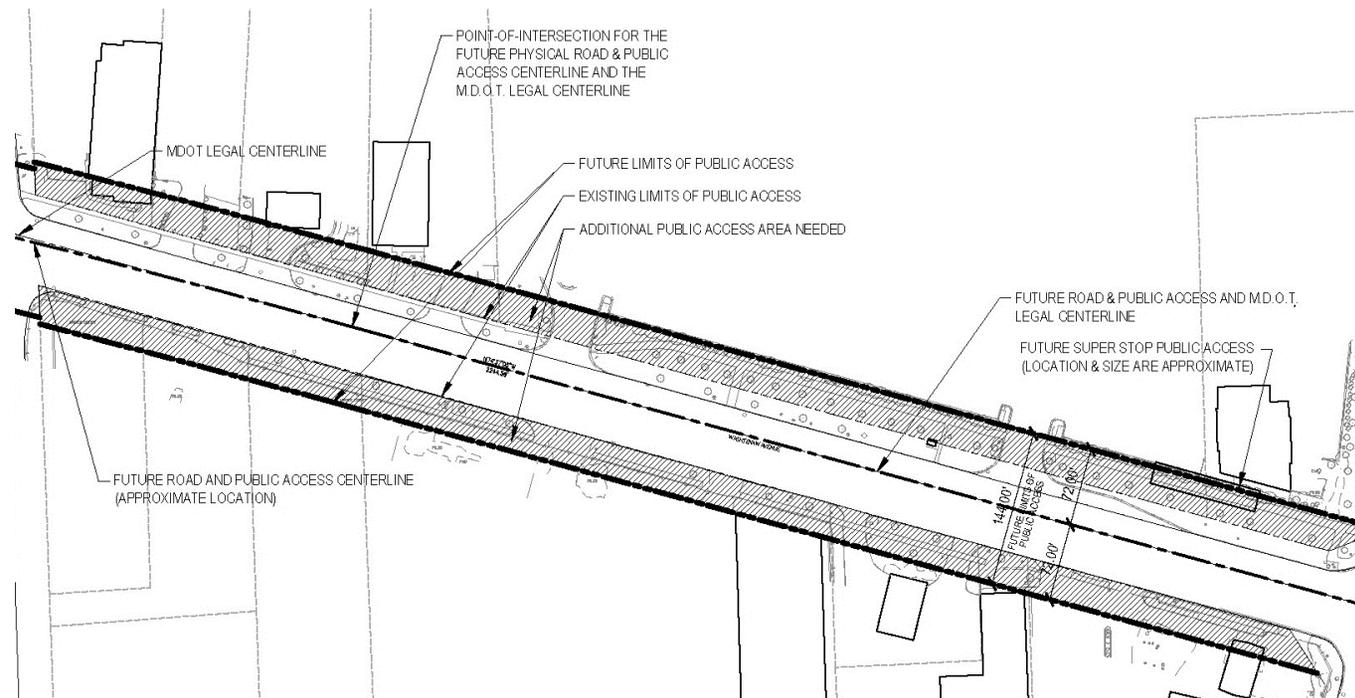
Typical Section from Future Limits of Public Access Plans
